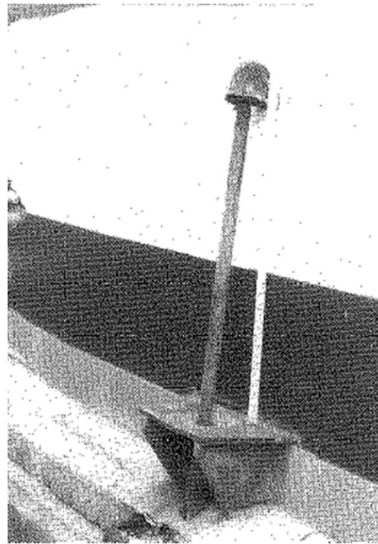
Anchor Bolt Pulled out due to Uplift of Tank Bottom [23]
